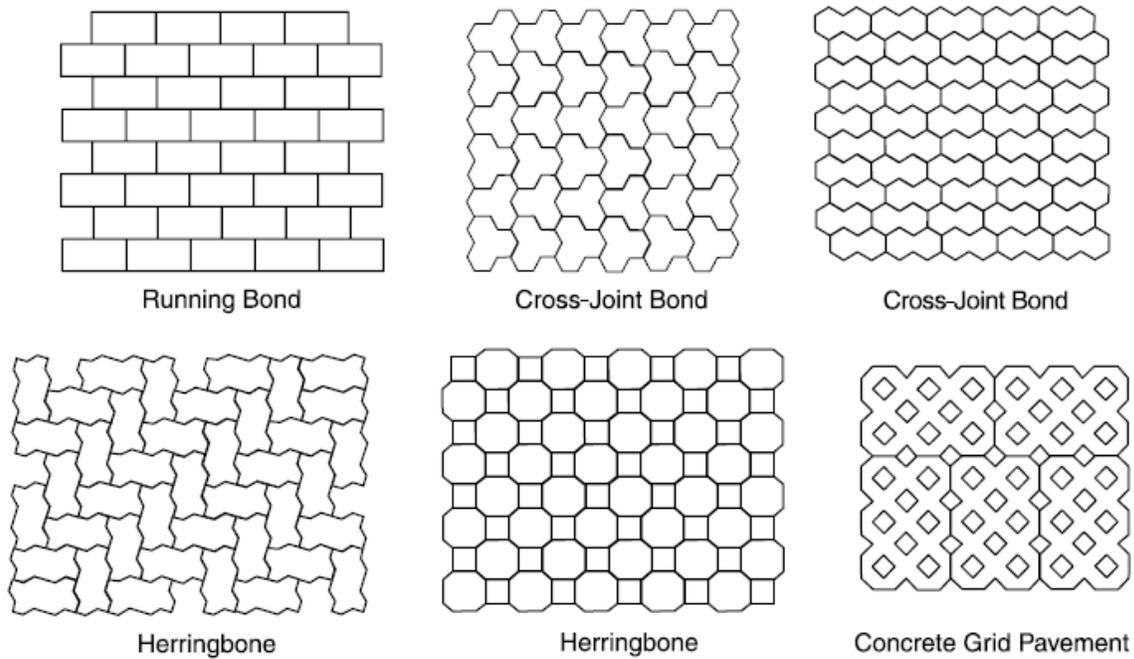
Various patterns for installation of permeable concrete pavers (Interlocking Concrete Pavement Institute, 2004)
